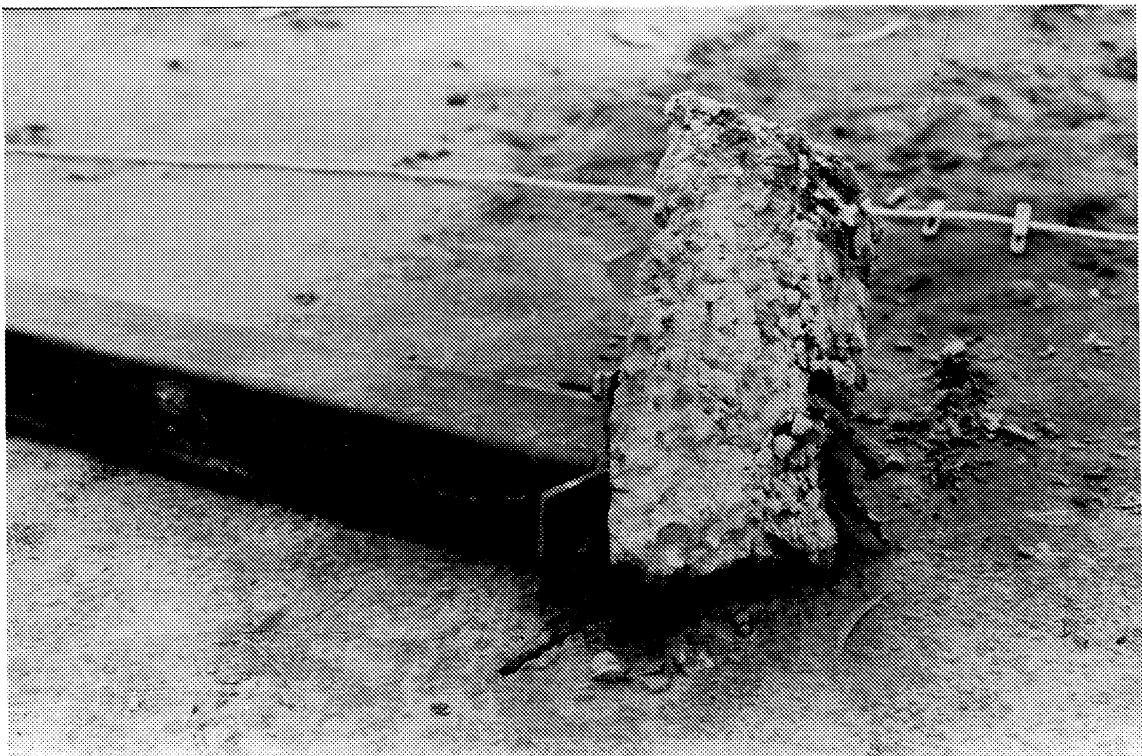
Detail showing failure of concrete slab at tie down column.
